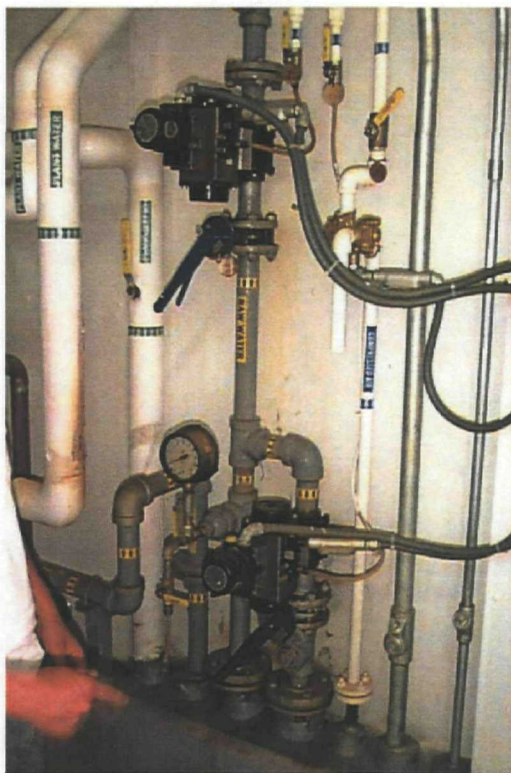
Leachate Treatment Plant, Influent Metering Point
